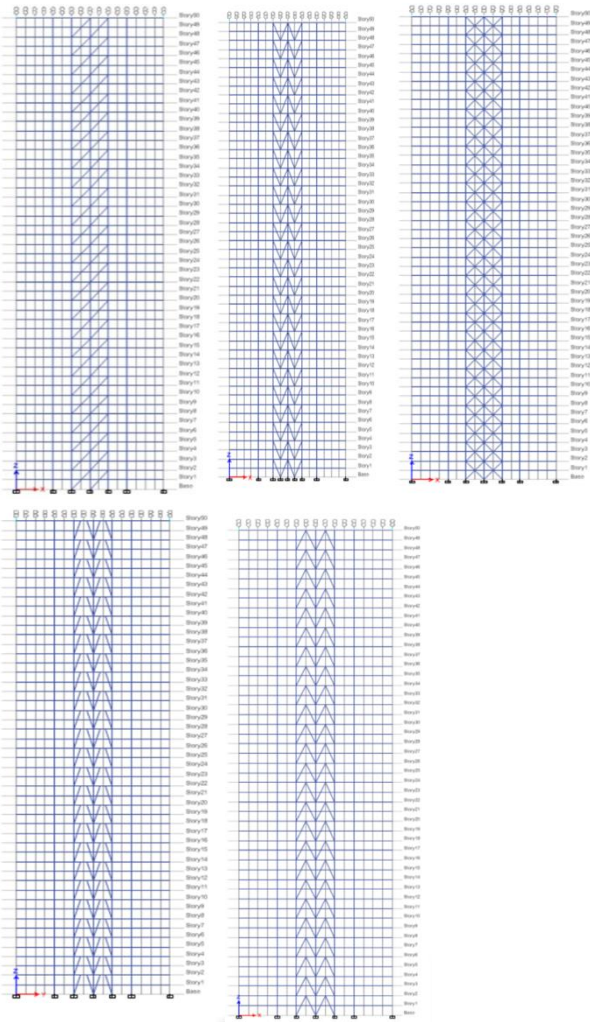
Elevations showing the different arrangements of the secondary bracing system
